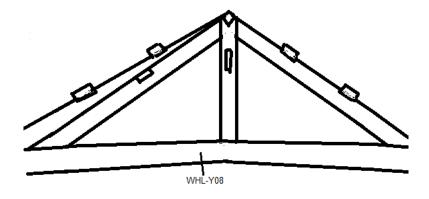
Sketch of truss 3, showing the location of sample WHL-Y08
